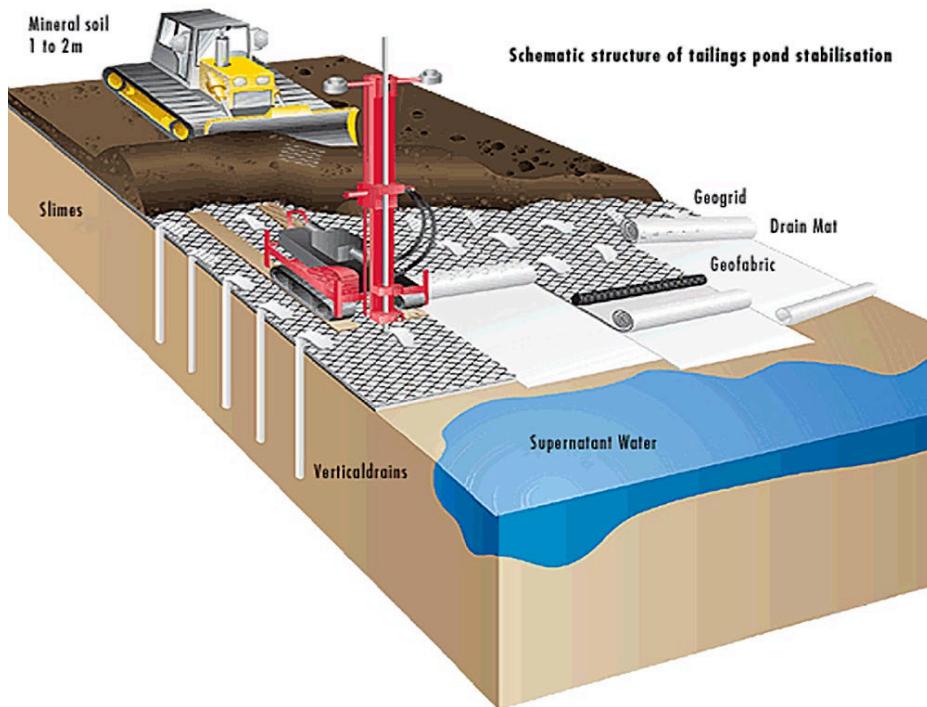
Stabilisation technology for tailings ponds: vertical drains in combination with a stabilisation package made of geofabric, drain mats, and geogrid. The system is covered with 1 to 2 m mineral soil or waste rock material to force consolidation (source: Wismut GmbH, 2019).
